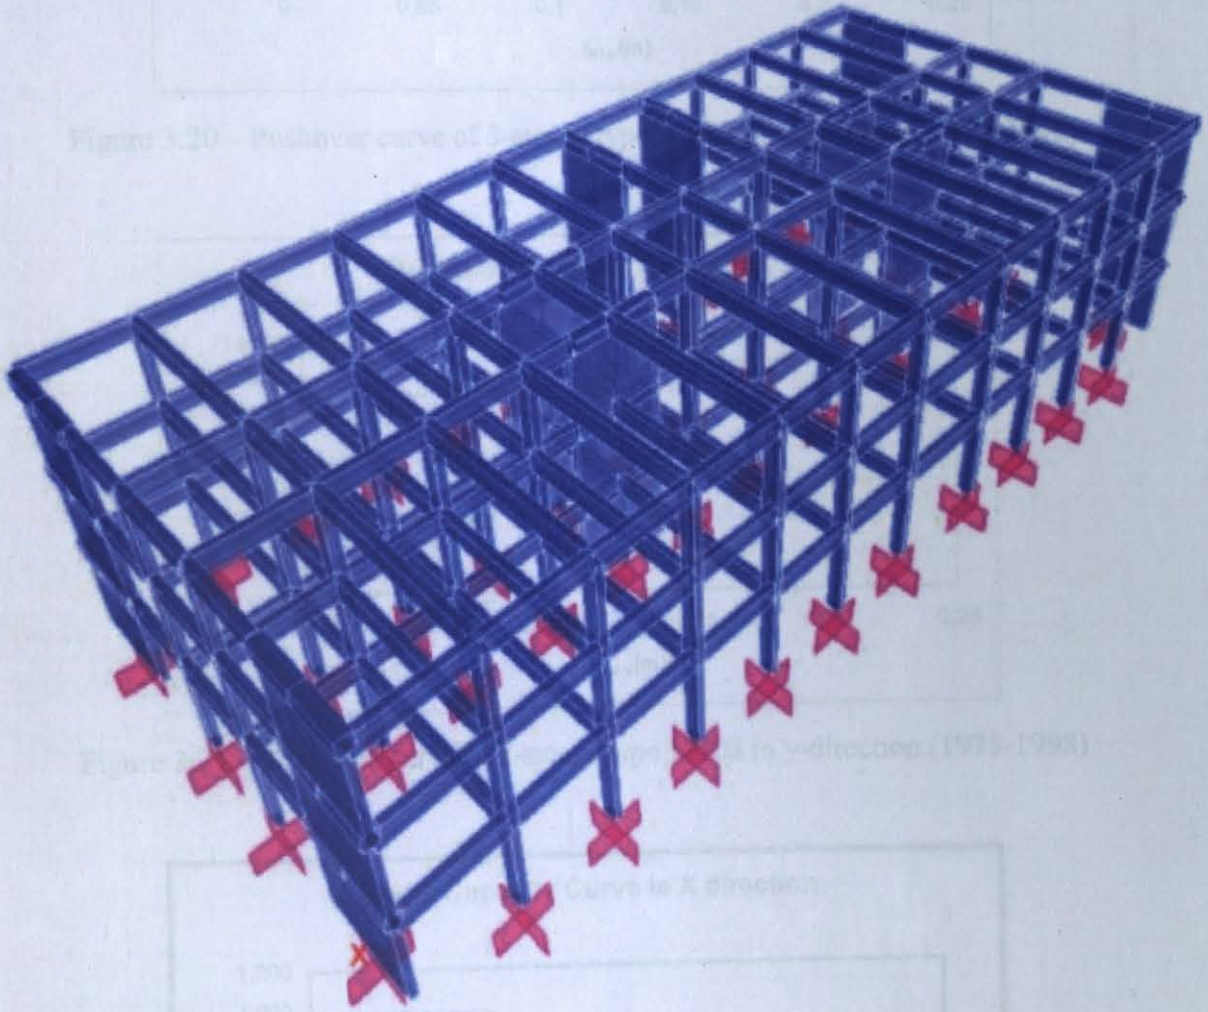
3D global Sap2000 model of 3 storey type 10403 (1975-1998)
